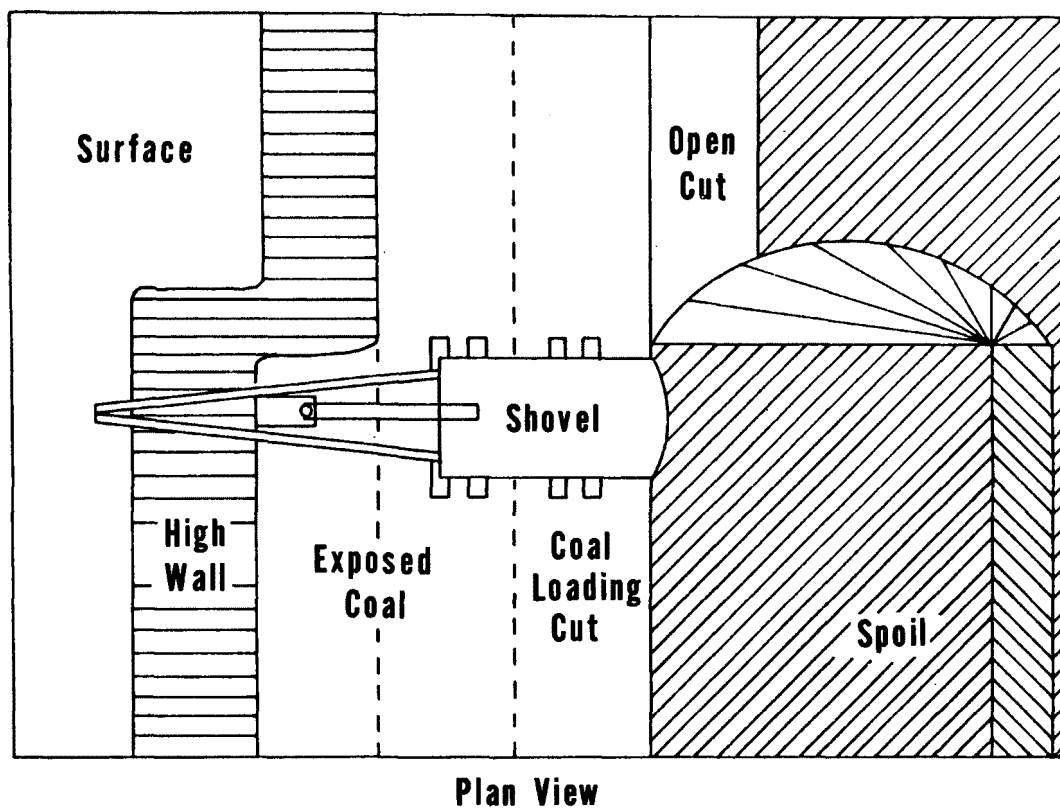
Plan section views of a Bucyrus-Erie 1950-B pit.
